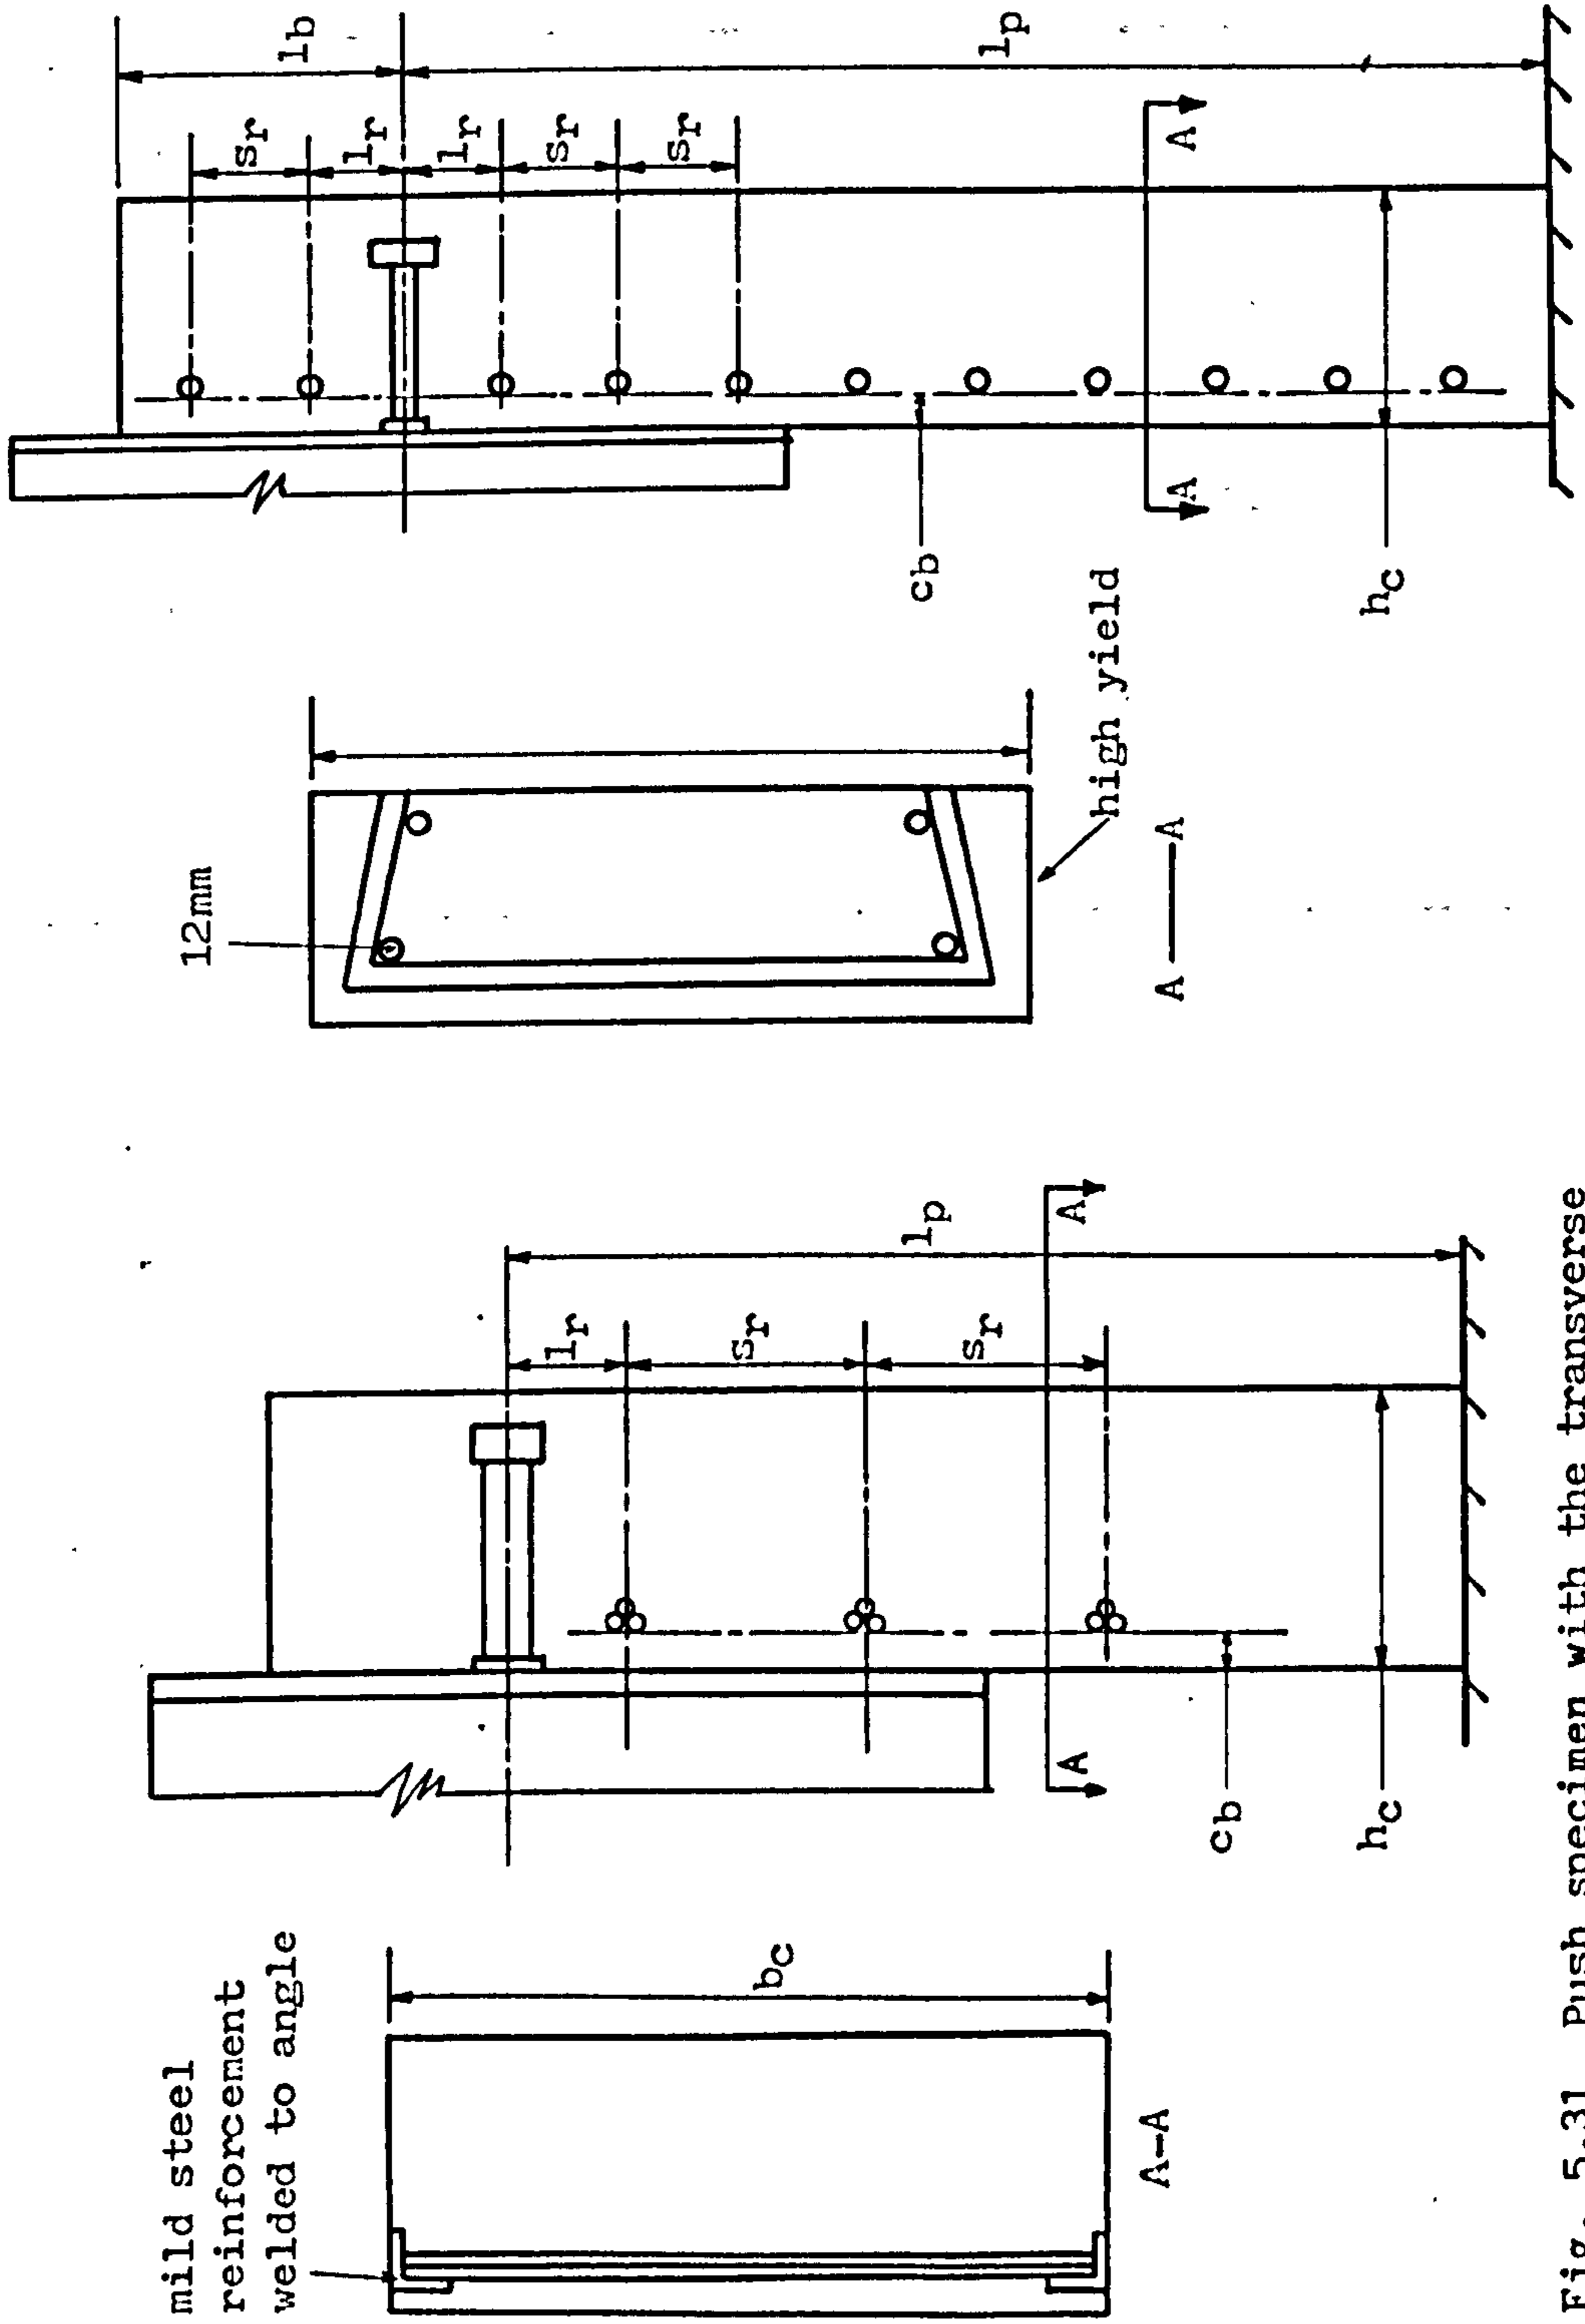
Push specimen with the transverse reinforcement fully anchored.
